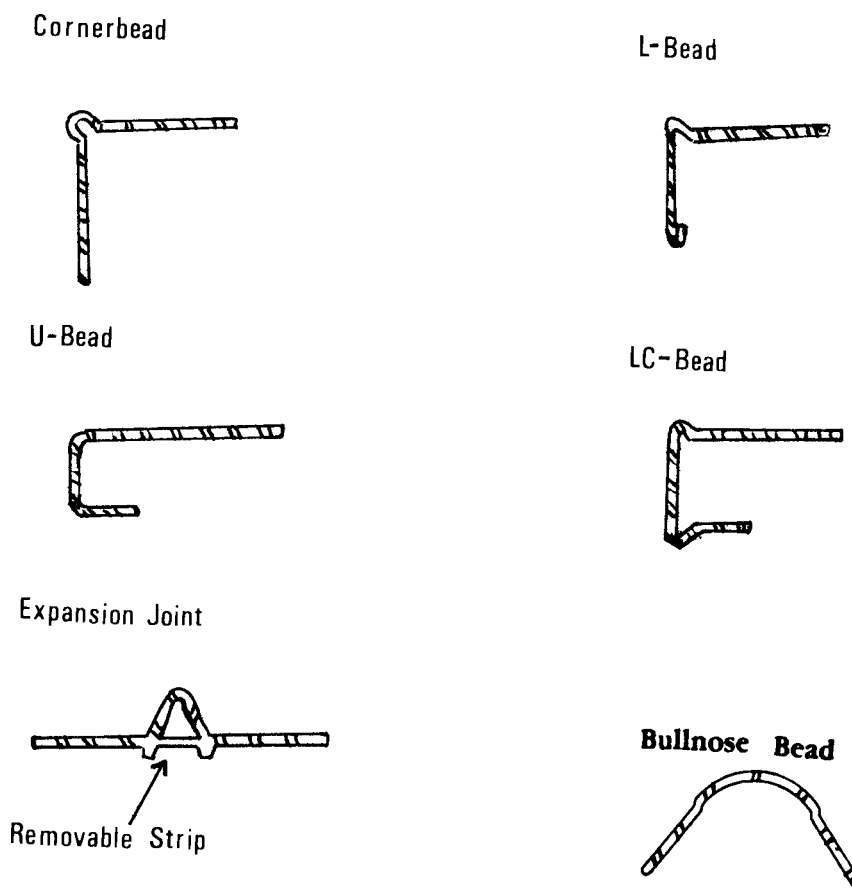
Accessories for Gypsum Wallboard and Gypsum Veneer Base
